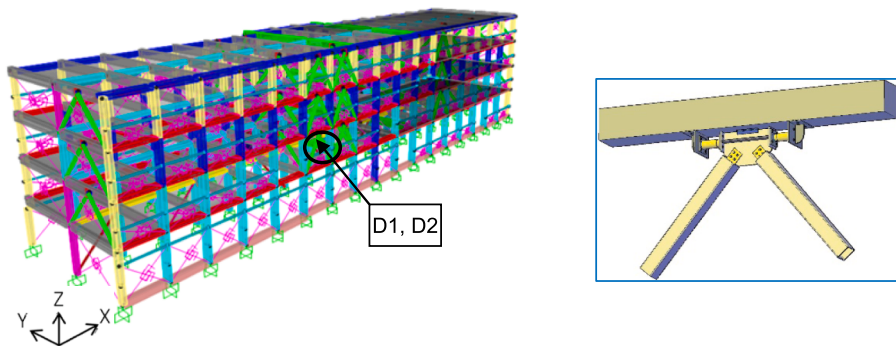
Finite element model of the structure including the dissipative bracing system, and installation detail of a pair of PFV spring-dampers.
